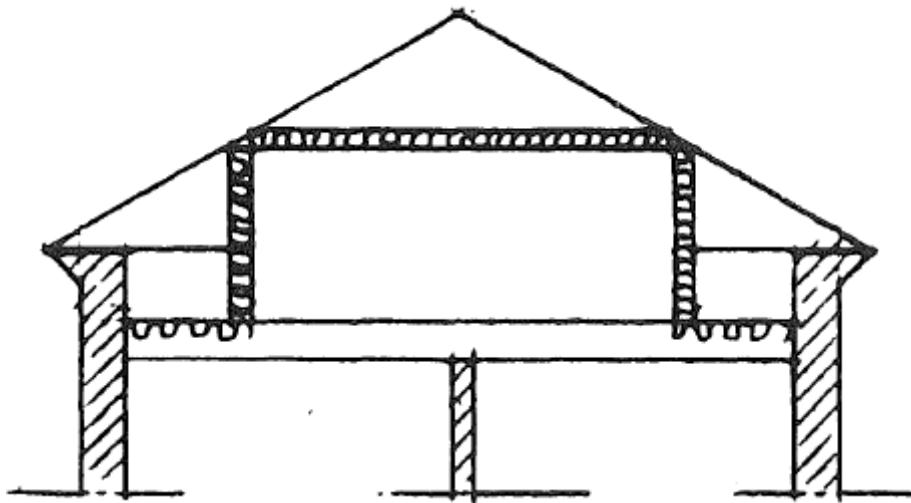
Section of an alternative to attic apartments (Bjerking, 1974).
